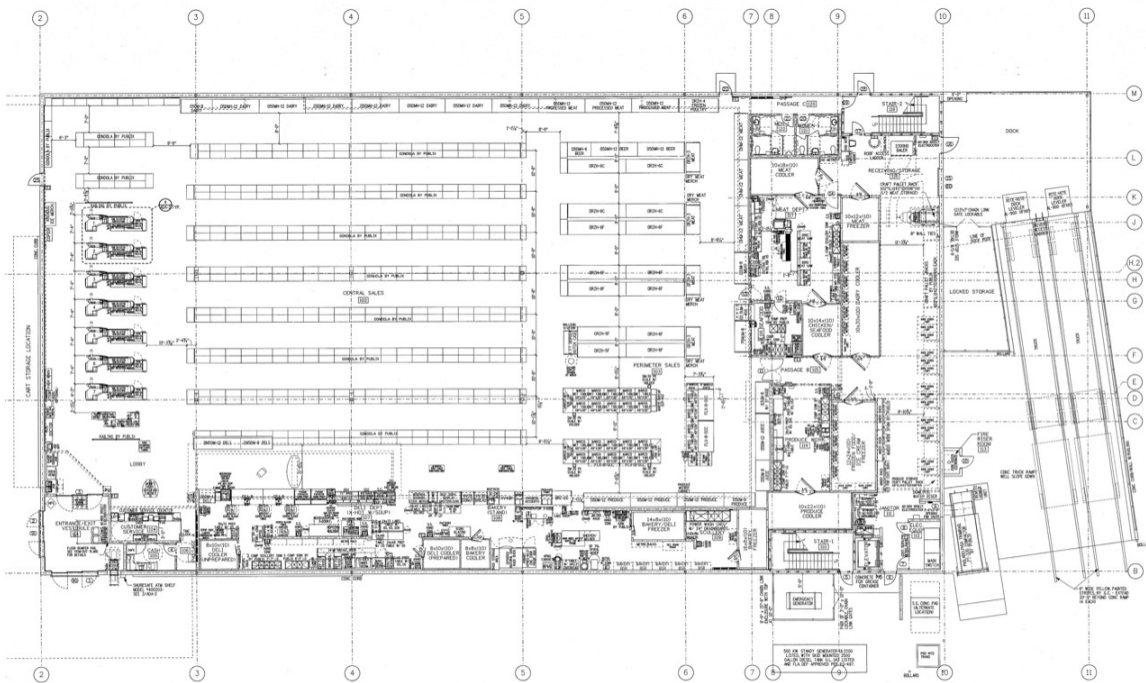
Publix Floor Plan – Approx. 47,000 SF
